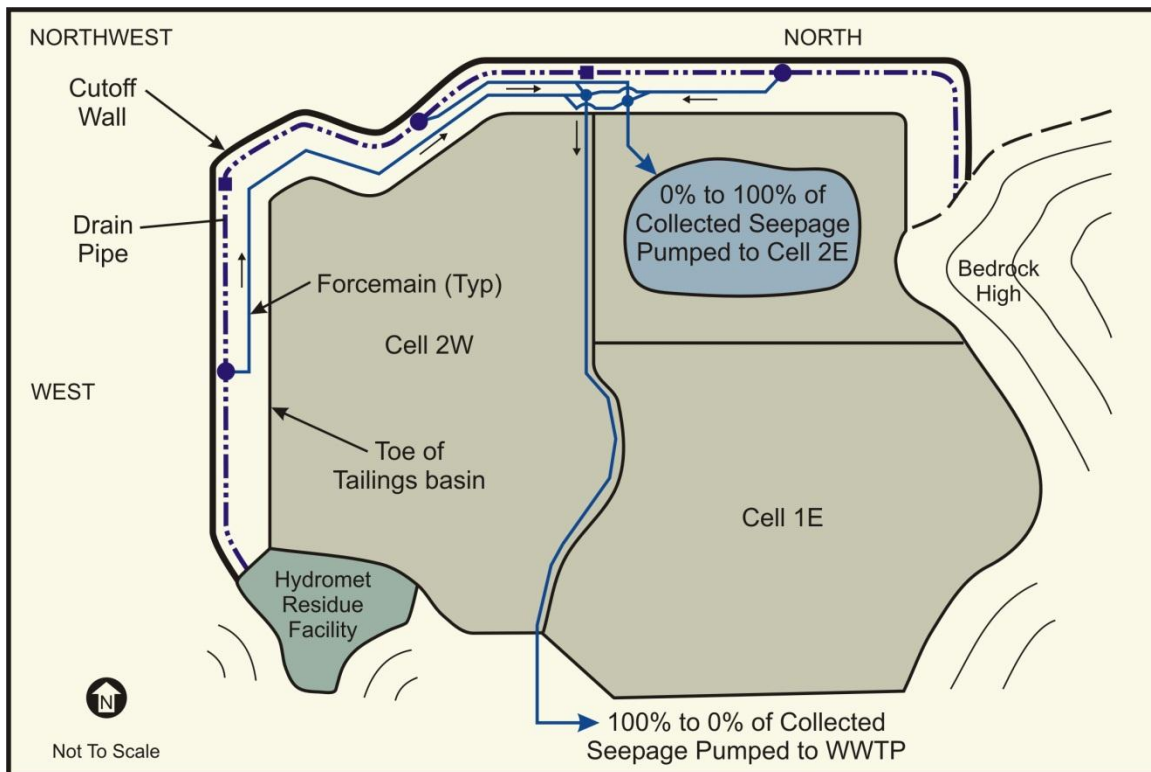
Conceptual Plan View: FTB Groundwater Containment System
